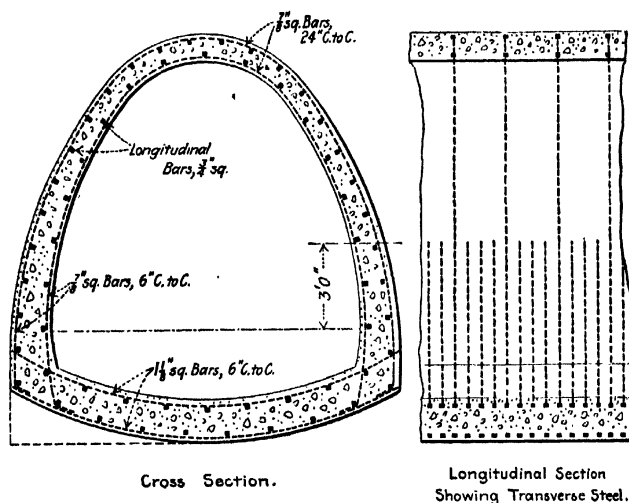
Steel reinforcement of 15 1/2-ft. semi-elliptical sewer.
